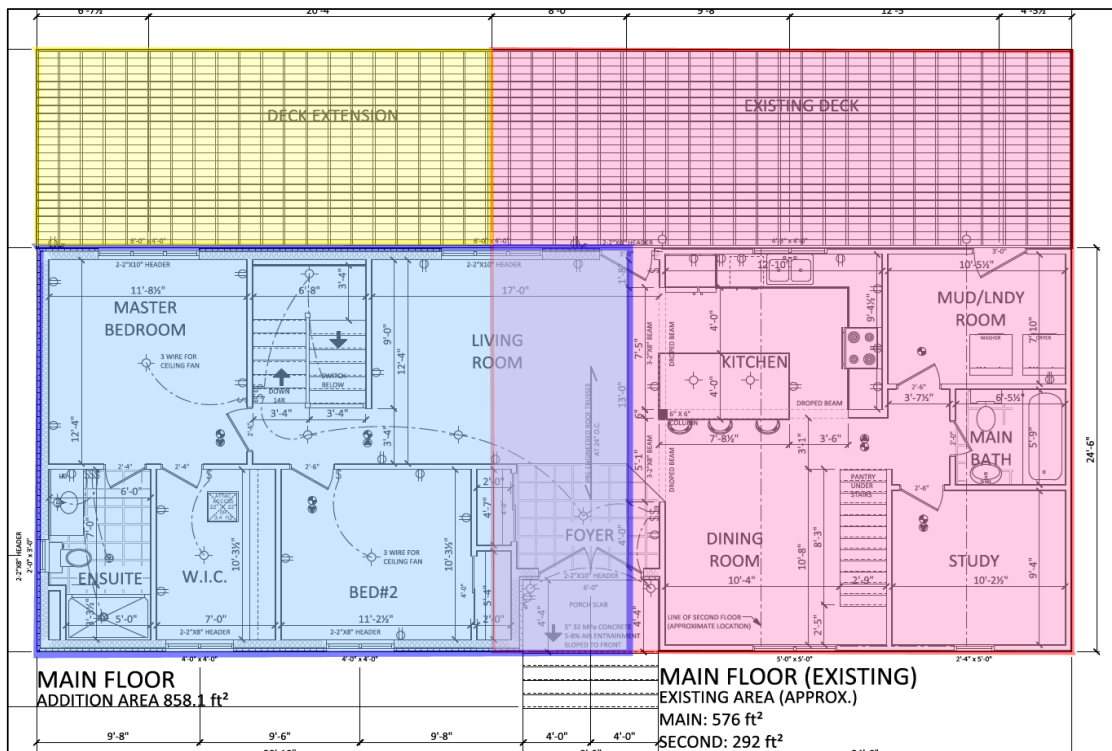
Sketch submitted with the application showing the existing footprint (red area), new interior living space (blue area) and uncovered deck extension (yellow area).
